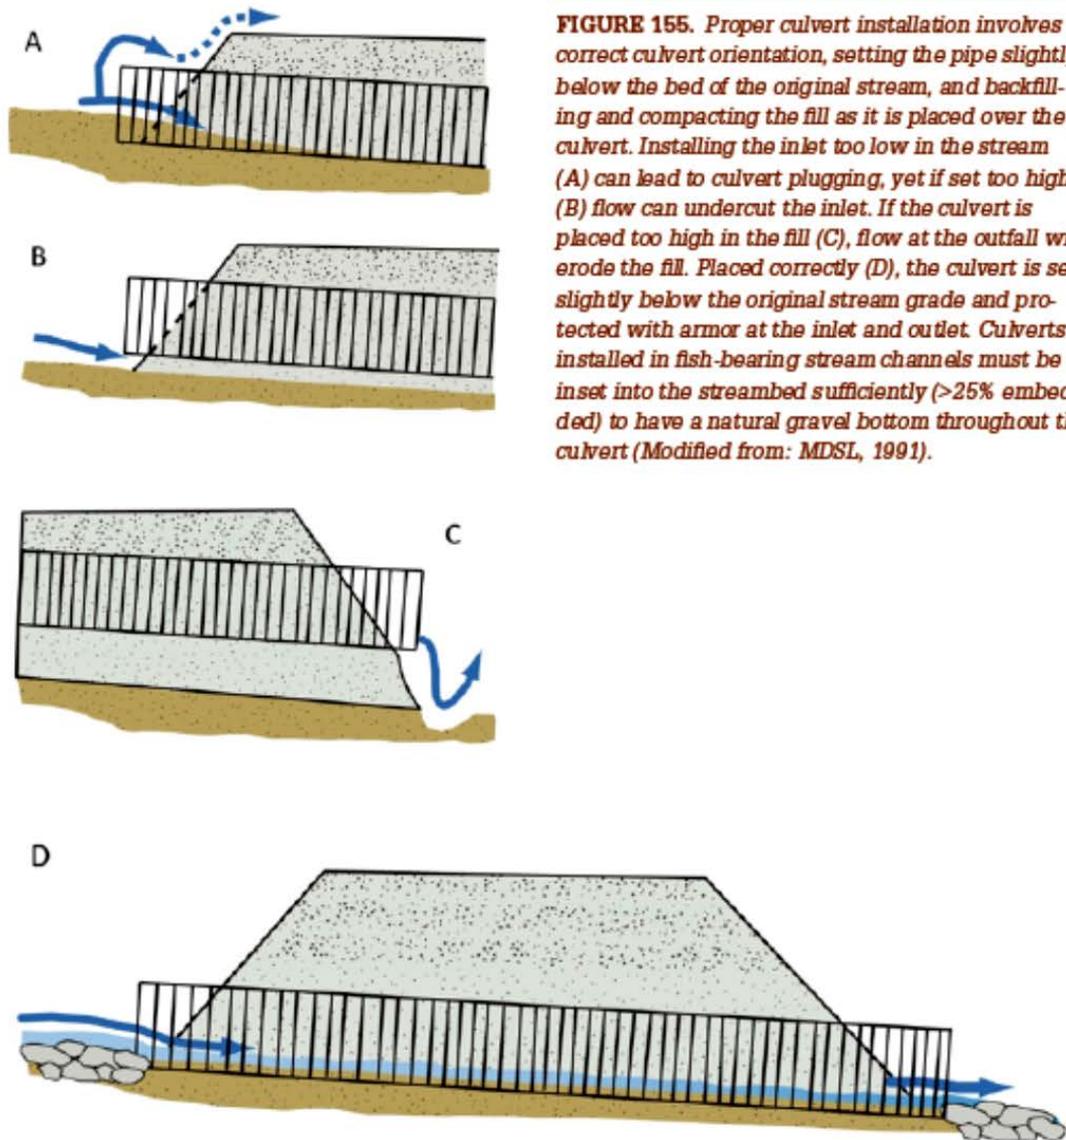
Proper culvert installation involves correct culvert orientation, setting the pipe slightly below the bed of the original stream, and backfilling and compacting the fill as it is placed over the culvert. Installing the inlet too low in the stream (A) can lead to culvert plugging, yet if set too high (B) flow can undercut the inlet. If the culvert is placed too high in the fill (C), flow at the outfall will erode the fill. Placed correctly (D), the culvert is set slightly below the original stream grade and protected with armor at the inlet and outlet. Culverts installed in fish-bearing stream channels must be inset into the streambed sufficiently (>25% embedded) to have a natural gravel bottom throughout the culvert (Modified from: MDSL, 1991).
